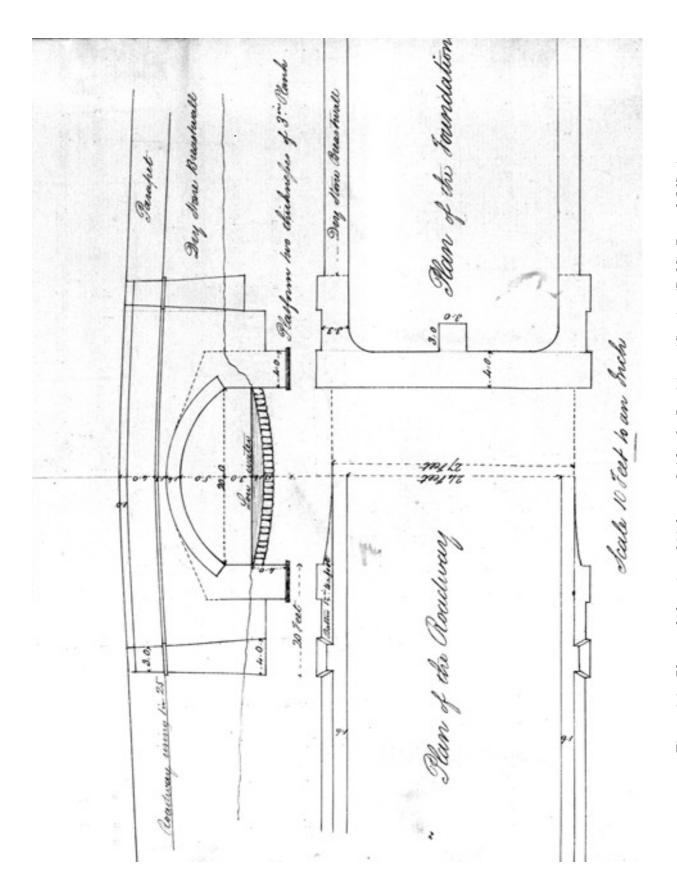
Plan and elevation of 20 ft span bridge for Lot 24 specification (Public Record Office)
